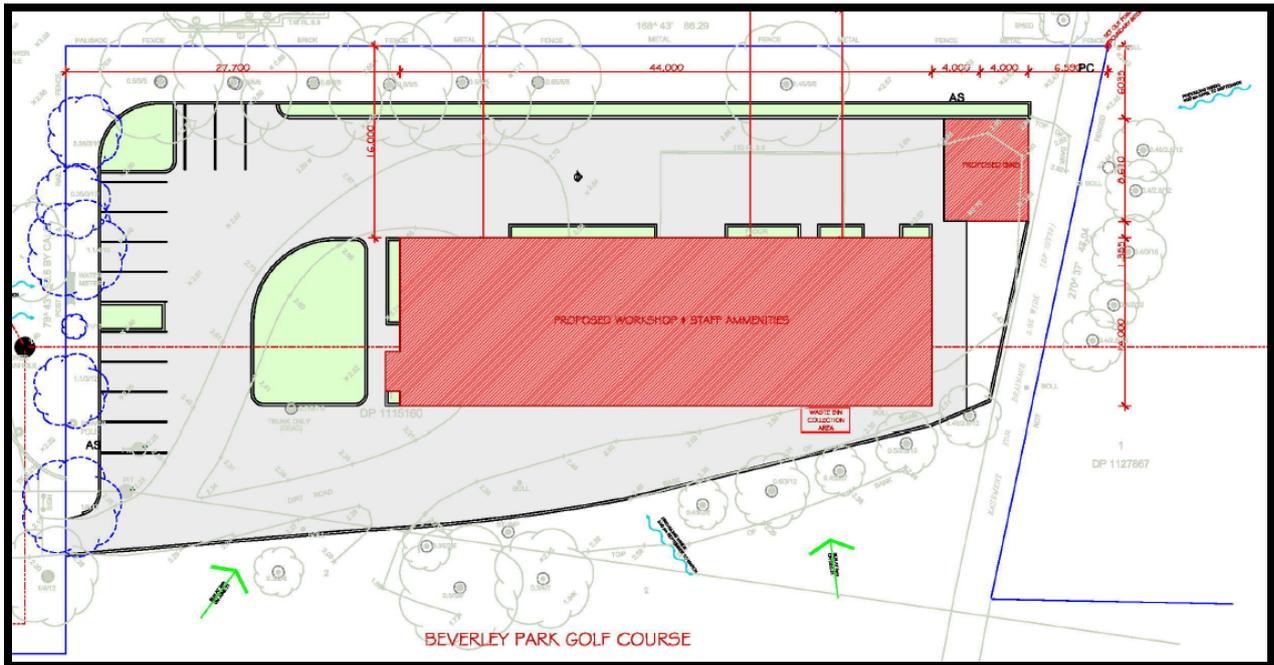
Previous site plan considered by Local Planning Panel 18 July 2019
